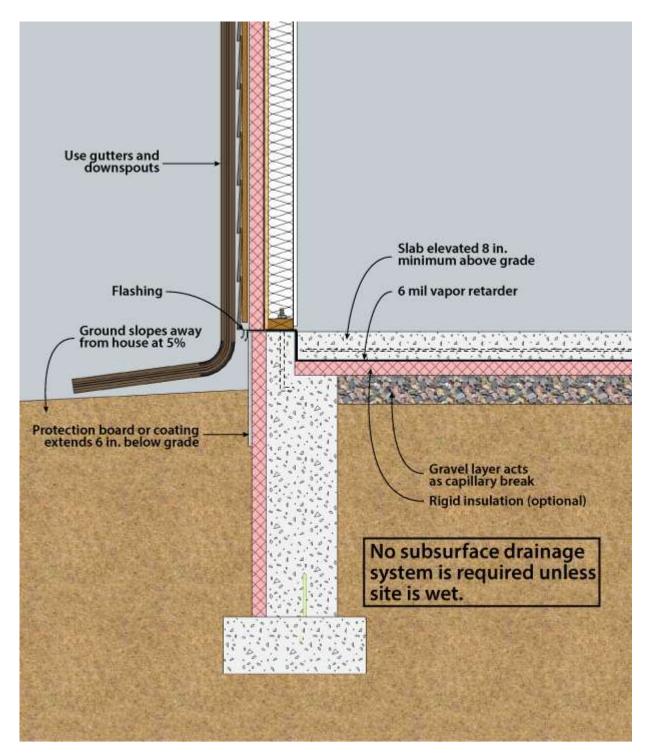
Drainage Techniques for Slab-on-Grade Foundations
